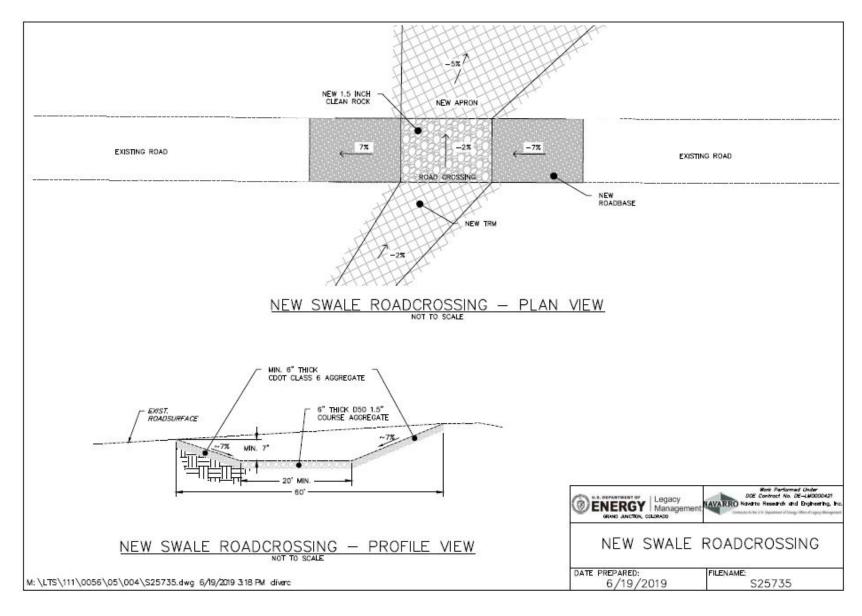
Solar Pond Plume Treatment System Access Road "Low Water" Crossing
